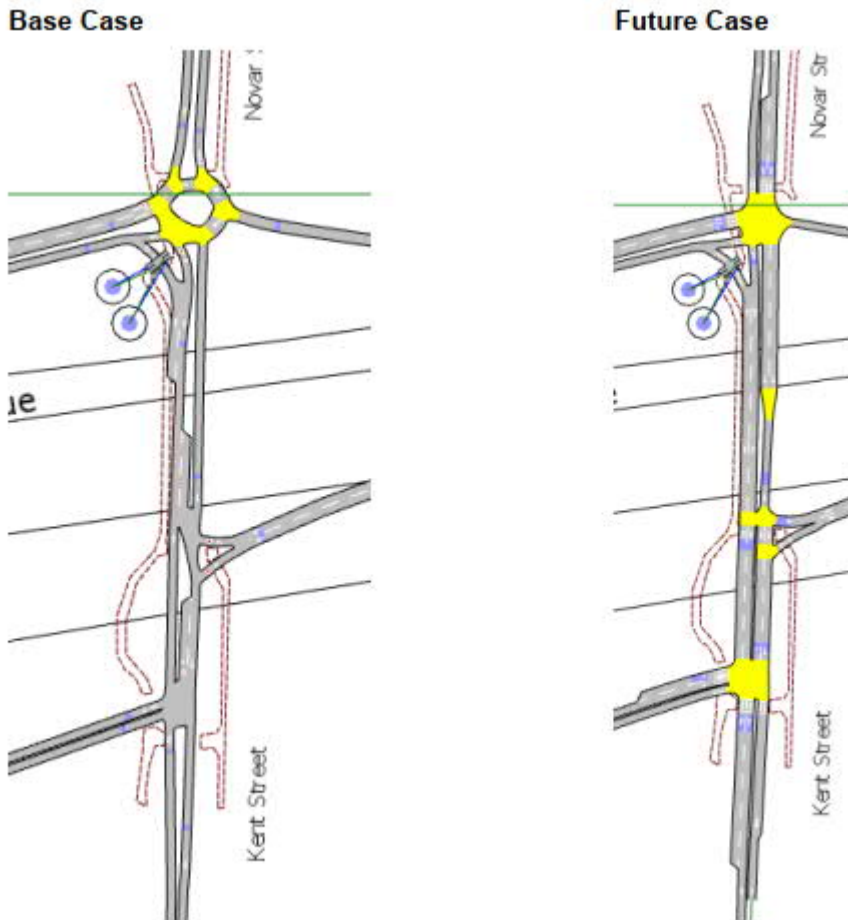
Kent Street Proposed Future Design from the Yarralumla Brickworks Report
